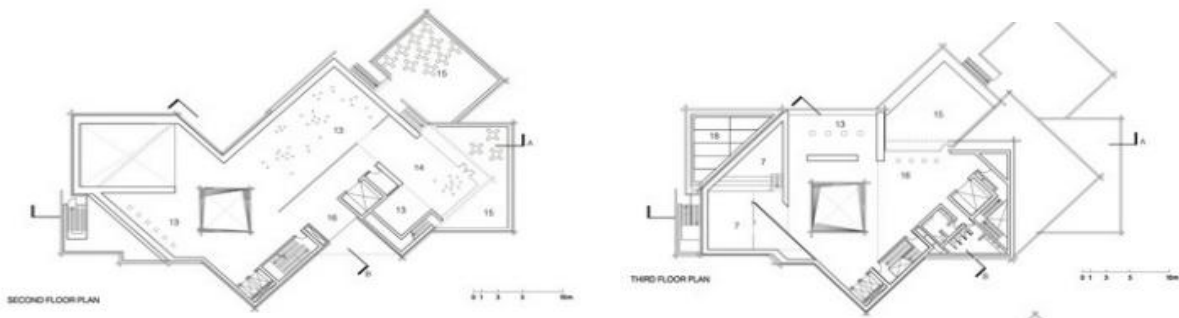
Second and Third Floor Plans of Odunpanzari
